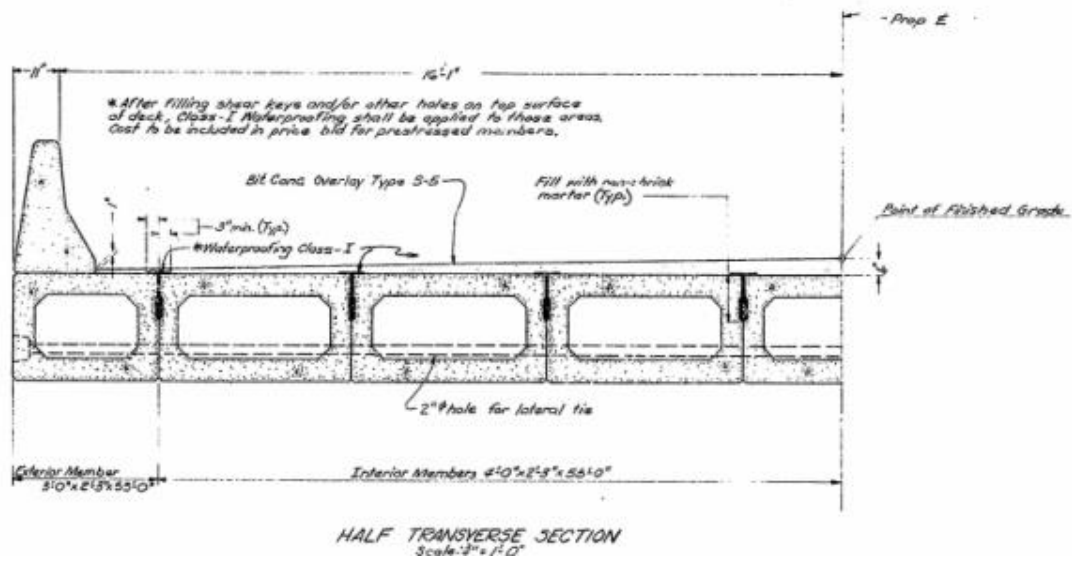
Cross Section of Arden Road Bridge (Halbe, 2014)
